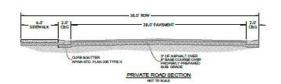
EXHIBIT "D" - PROPOSED CONCEPT SITE PLAN
